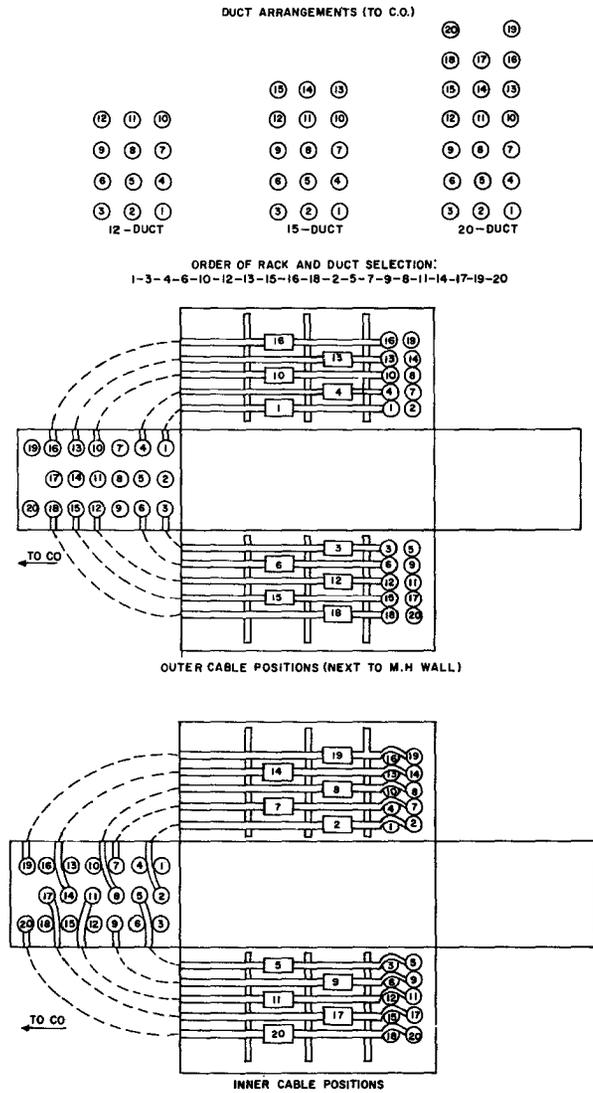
Type T Manhole—6-Foot Wide—20-Duct Capacity—3-Wide Configuration
